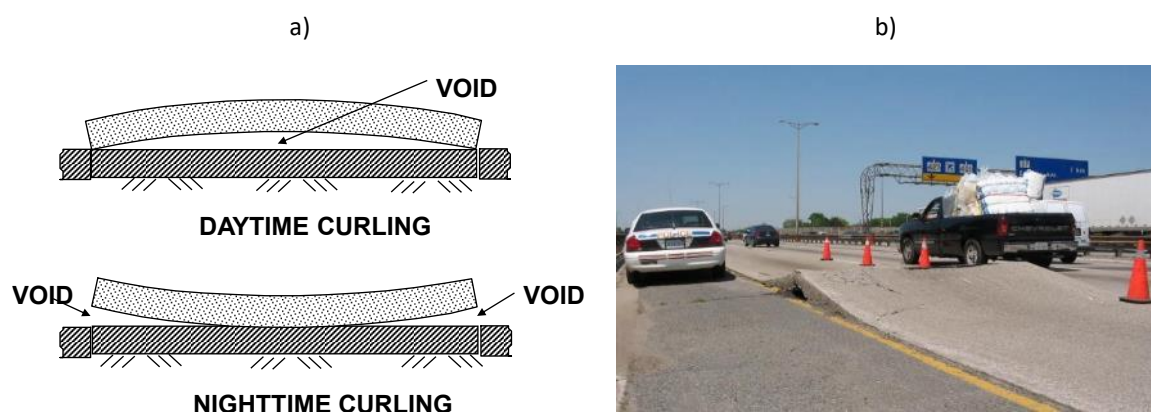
Damage to concrete pavement due to extreme heat. a) curling process of concrete slabs;
